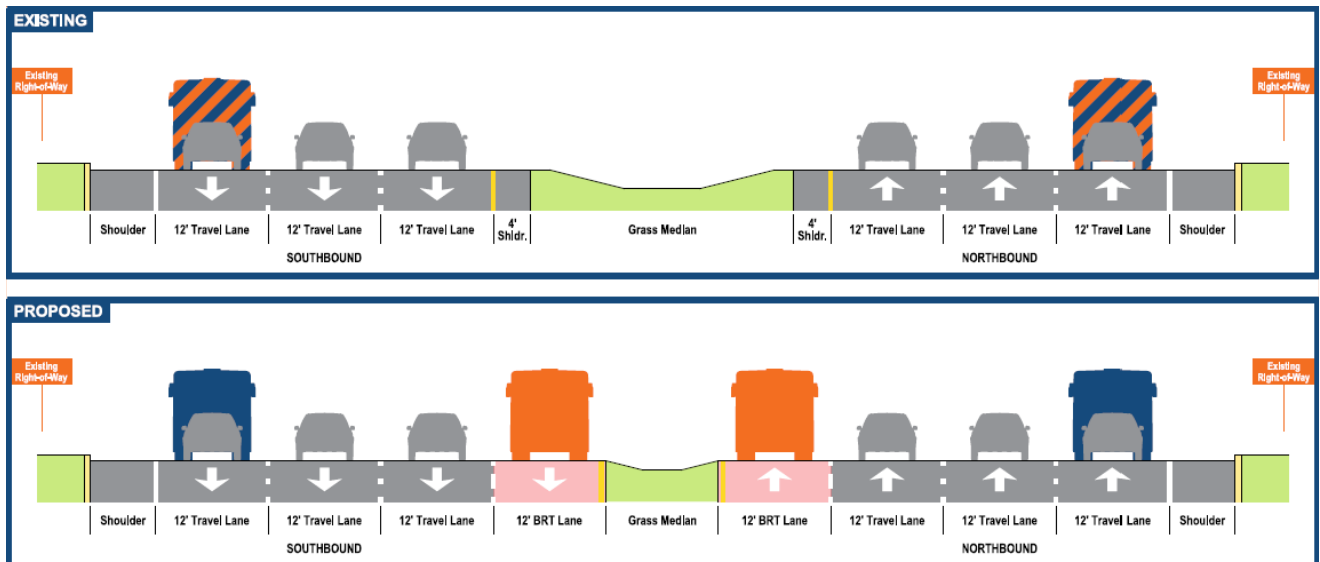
Existing and Proposed Cross-Section from North of Stewart Lane to End of Project
